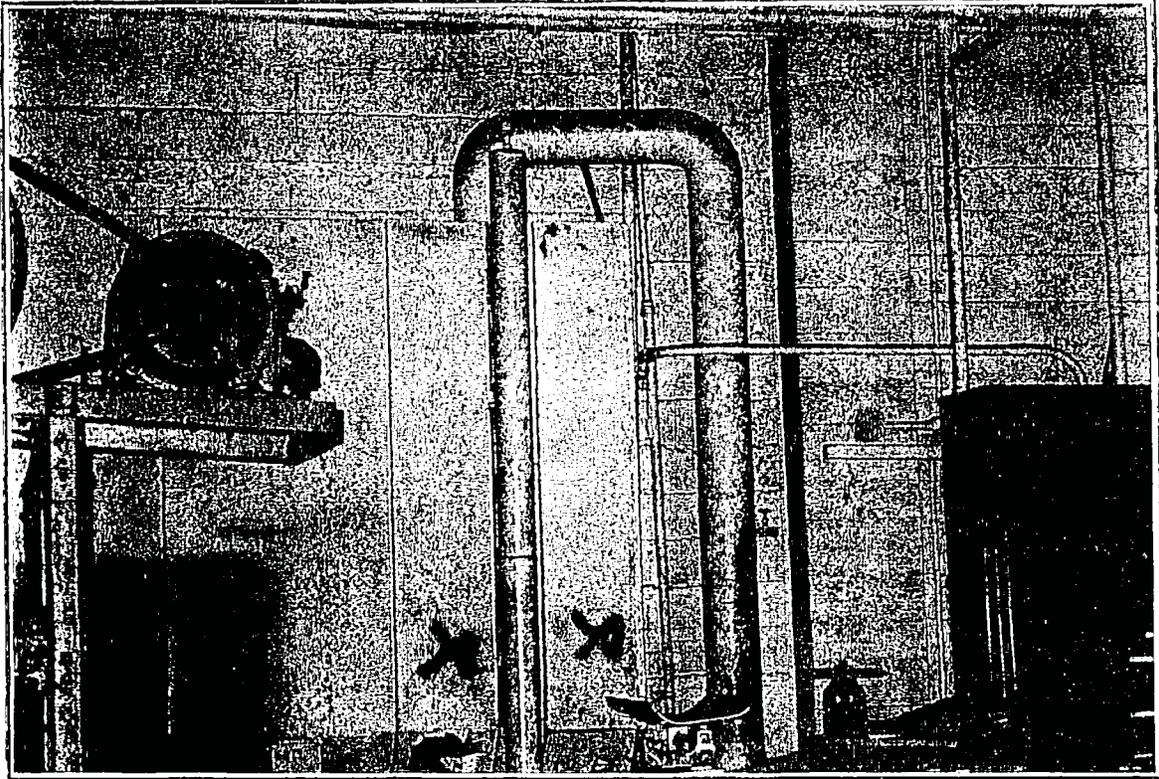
PIPE INSULATION AT SOUTH WALL OF MACHINE SHOP.
